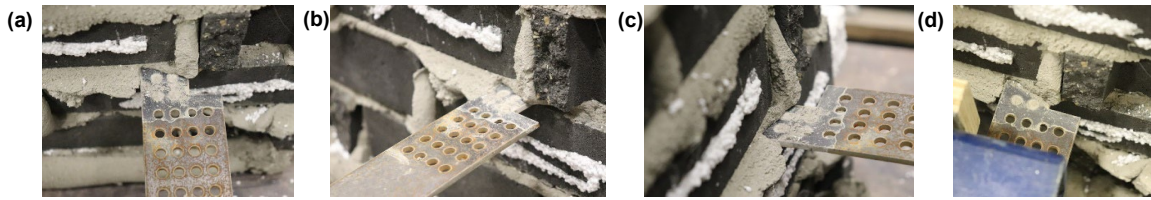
T-PH.CN-1 after testing of (a) top view, (b) elevated side view, (c) alternative elevated side view, (d) top view
